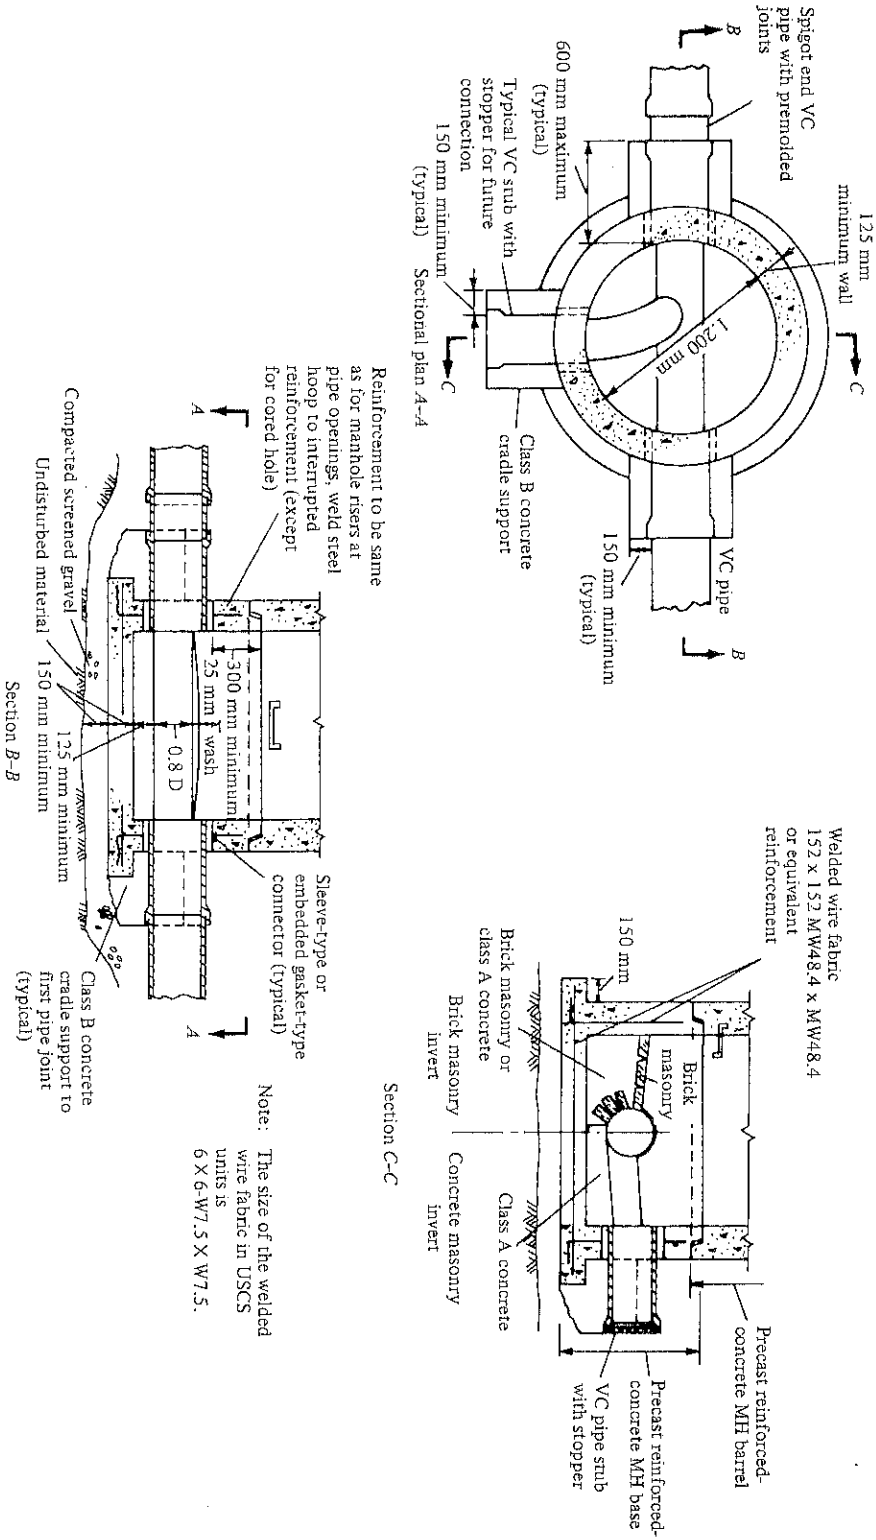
Typical precast reinforced-concrete manhole base for vitrified-clay sewers 600 mm in diameter and smaller. Note: mm x 0.03937 = in.
